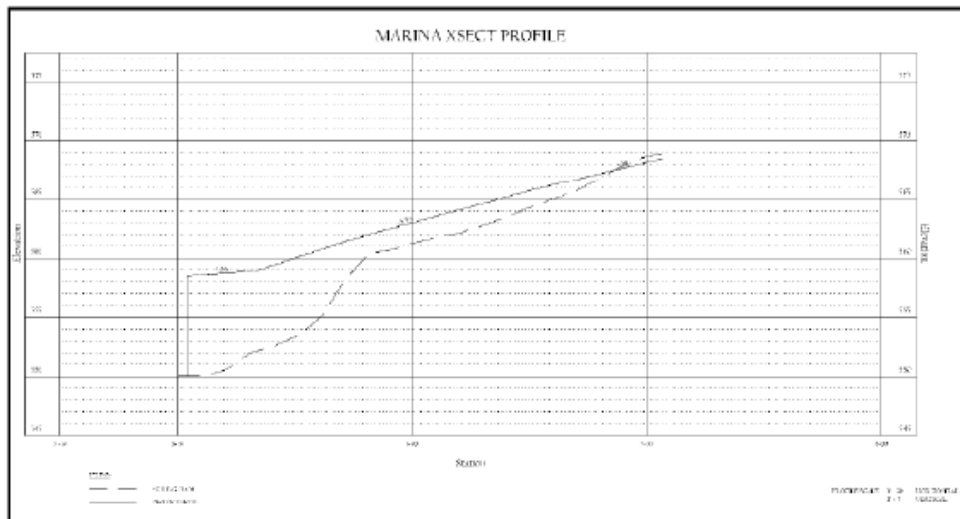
Profile view depicting proposed fill placed on top of existing ground surface.
